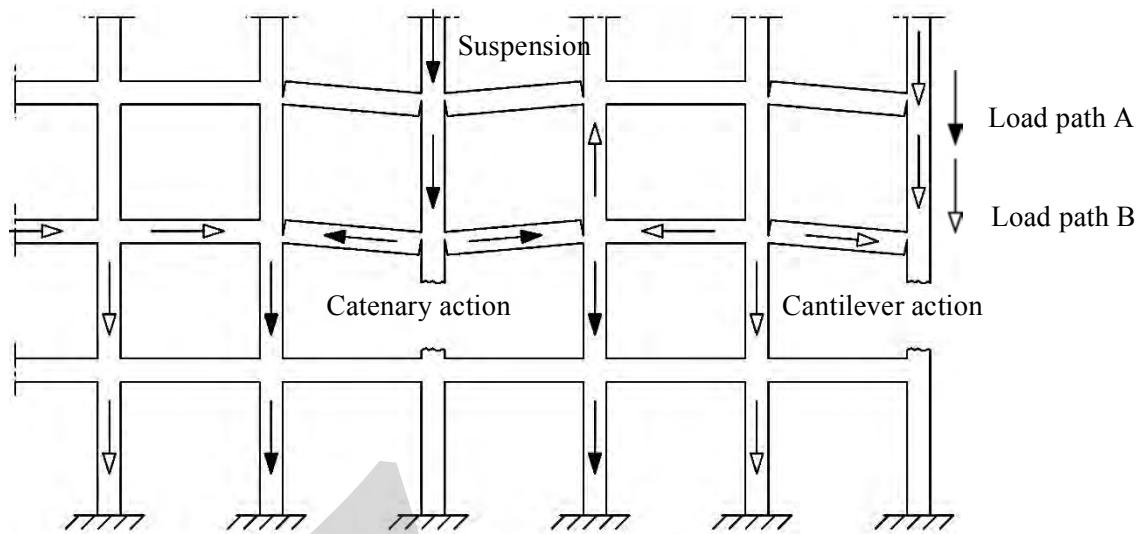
Alternative mechanisms for alternative load path in skeletal structures [41]
